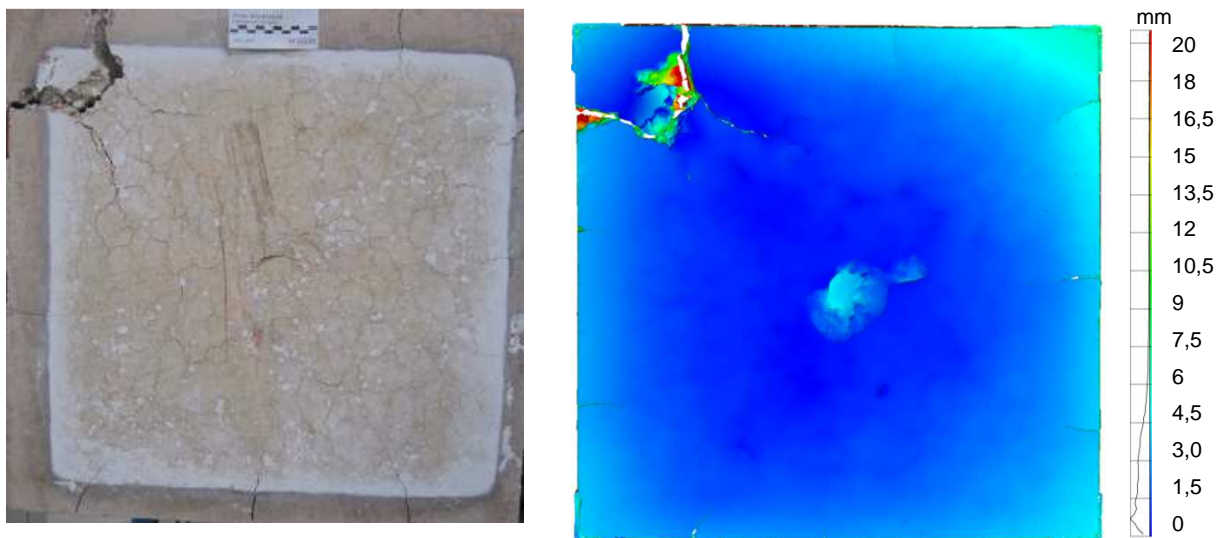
DFG-B15/6 - MFI25 – 0,9 kg/m³ - spalling volume 0%, cracks and deformation
